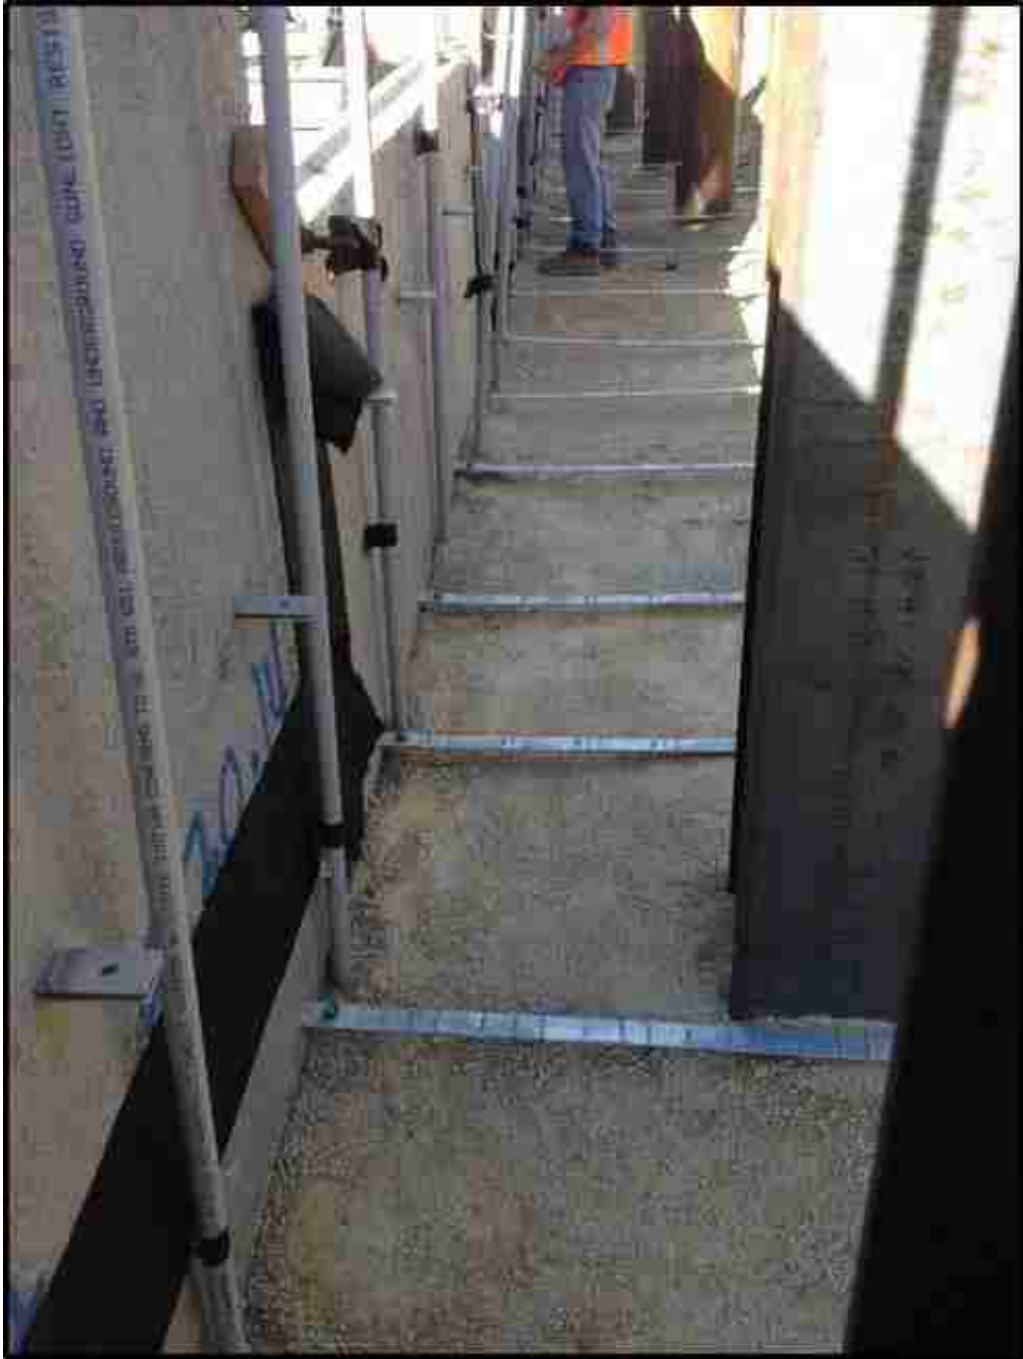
RECO steel ribbed strip soil reinforcing set up.
